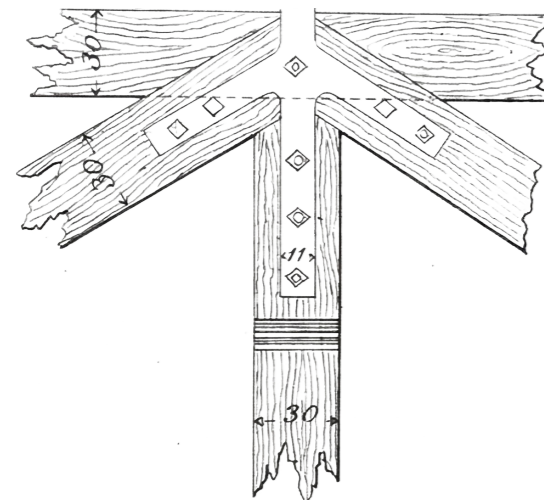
Timber tension rod connection (elevation view)(Henket et al., 1889)
